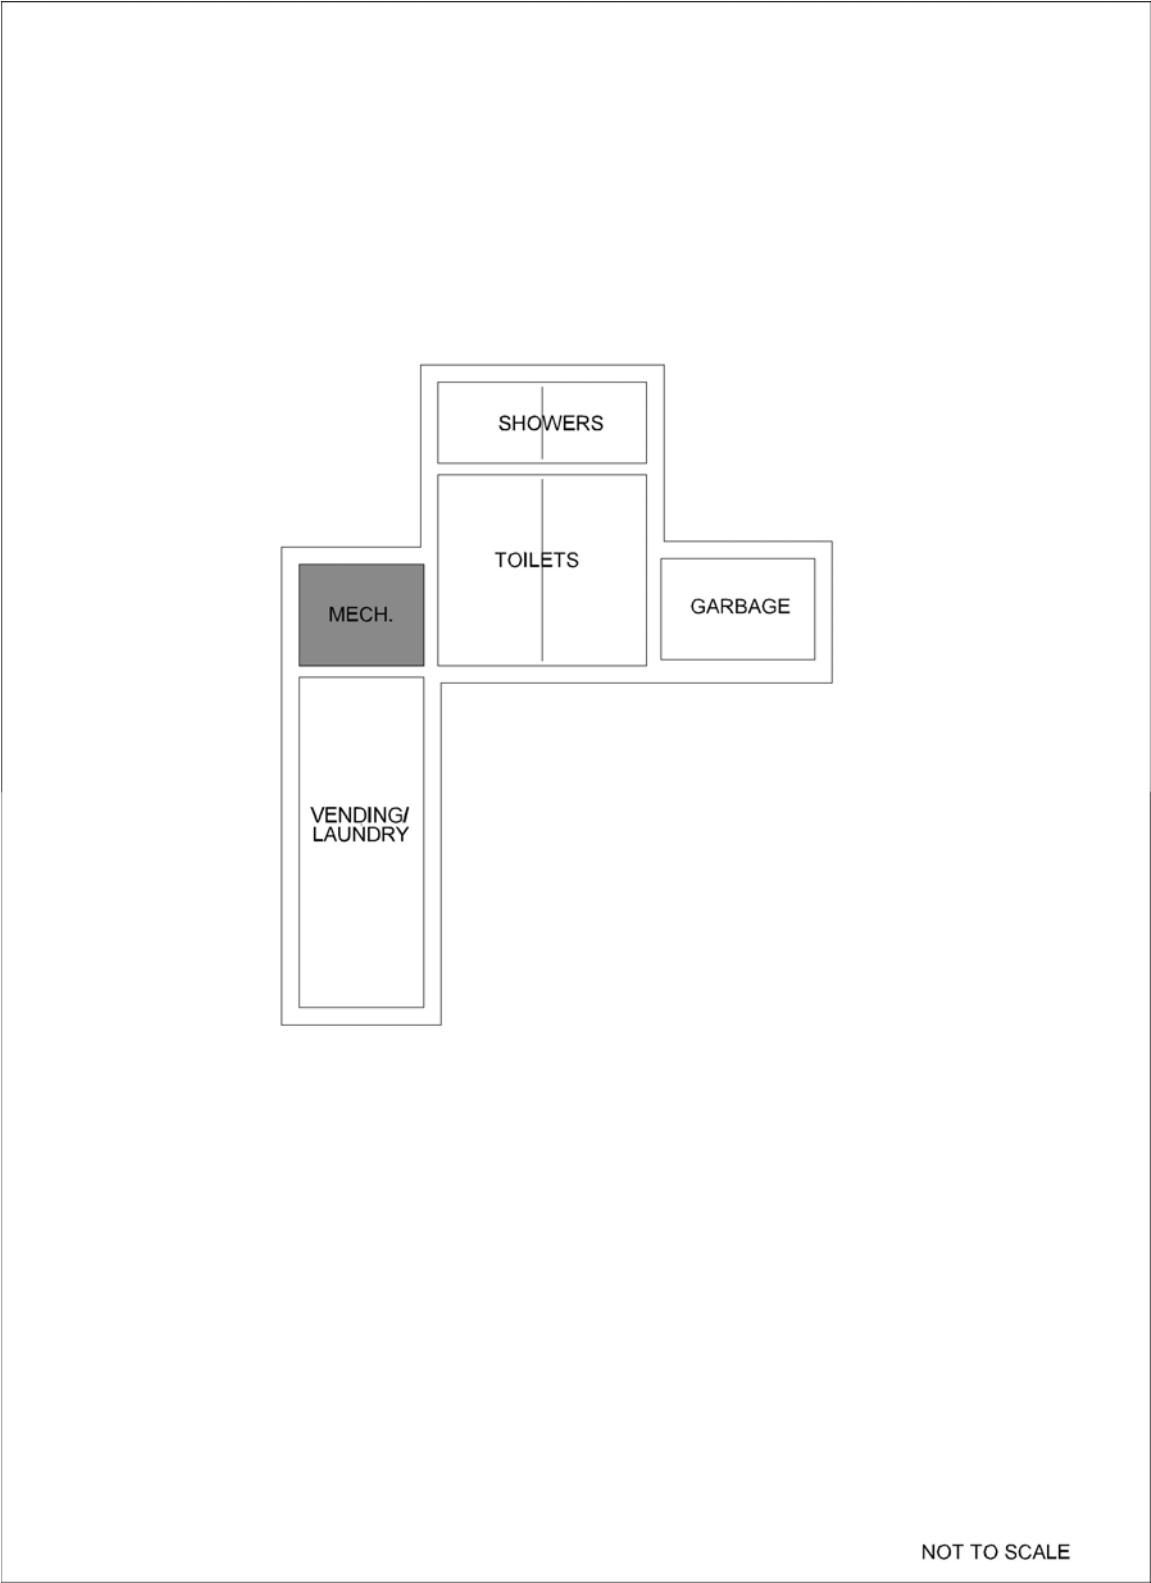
Recreational Campground – Medium Size Support Facility
